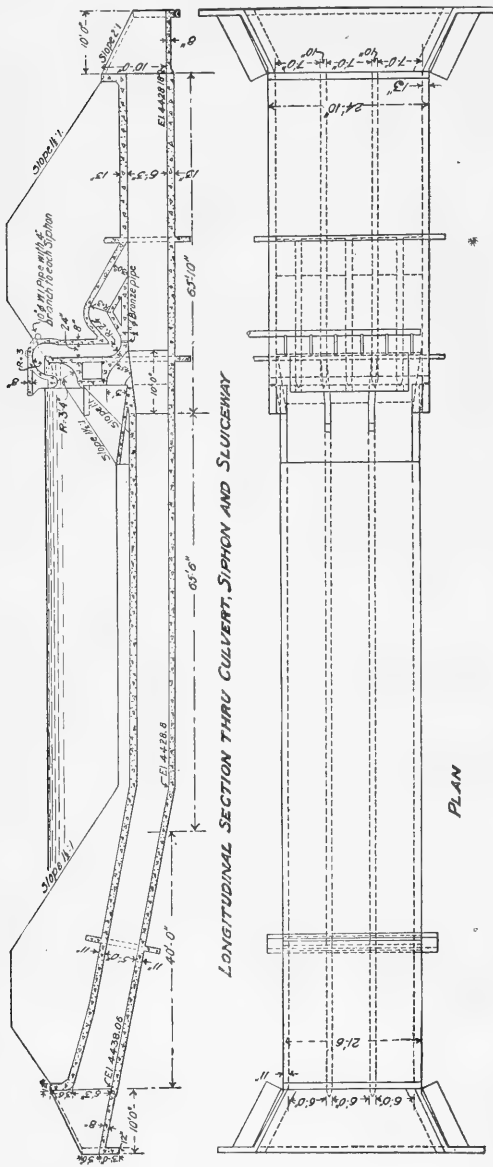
Cross section and plan of combination storm culvert, sluiceway, and siphon wasteway. Built on main canal of the U. S. Reclamation Service, Sun River project, Mont.
